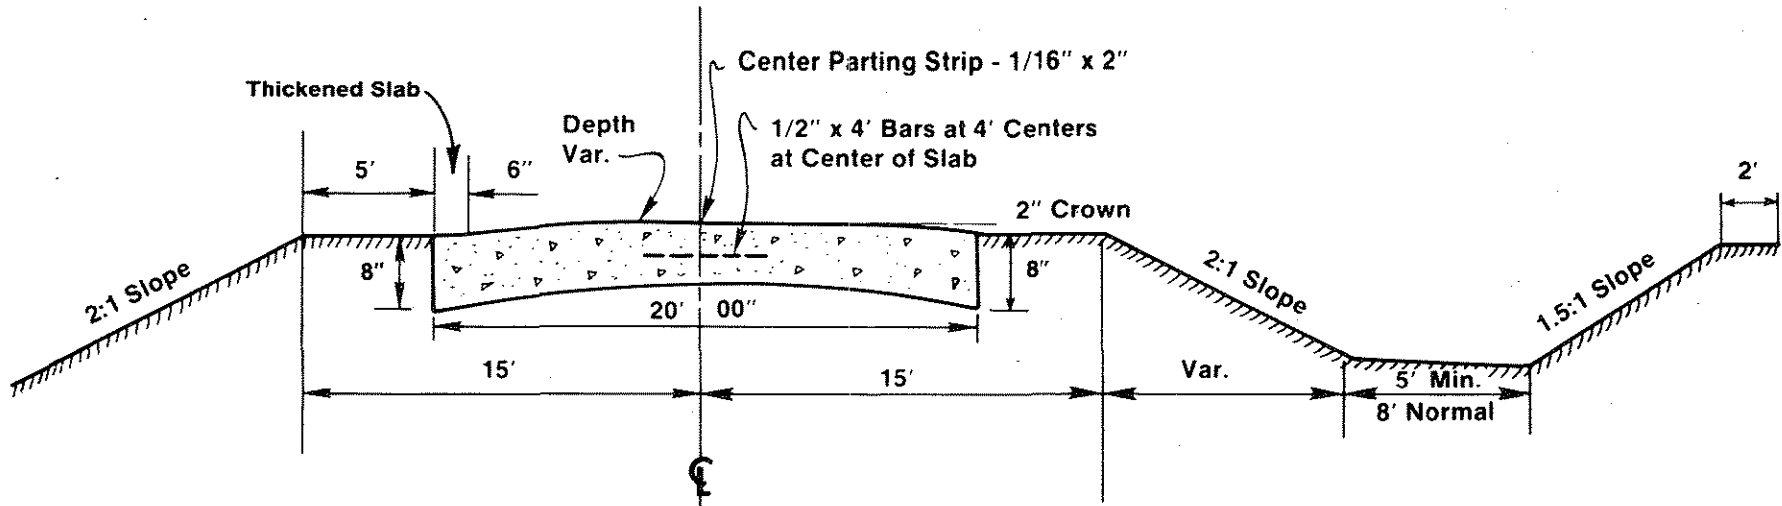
Layout for Pavement - Non-Reinforced Pavement
